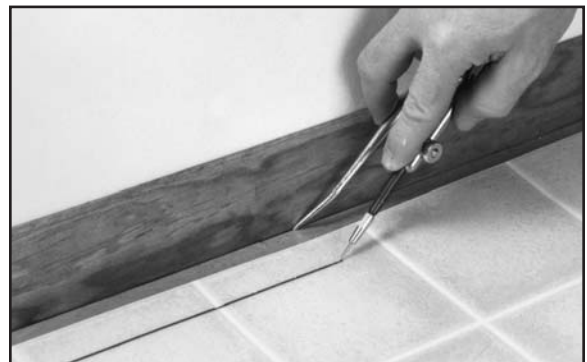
Position flooring as close to wall as possible. Use shortest scriber setting possible.
